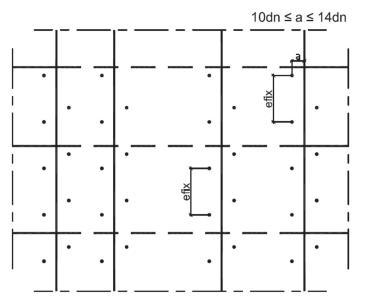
Fixed nailing pattern for first layer of the MHM – wall element
